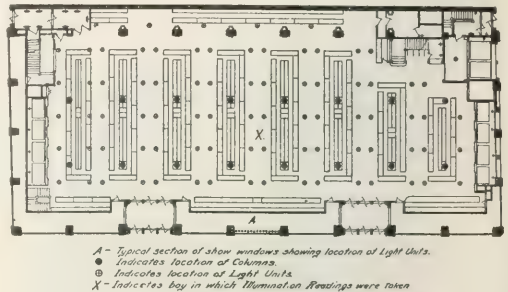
LIGHTING ARRANGEMENT OF FIRST FLOOR
